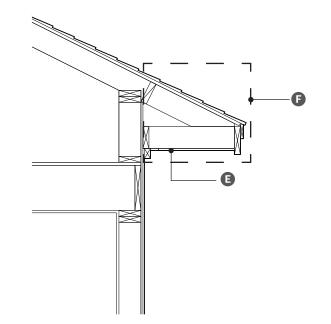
E Section detail of Highest Top Plate for pitched roof.
